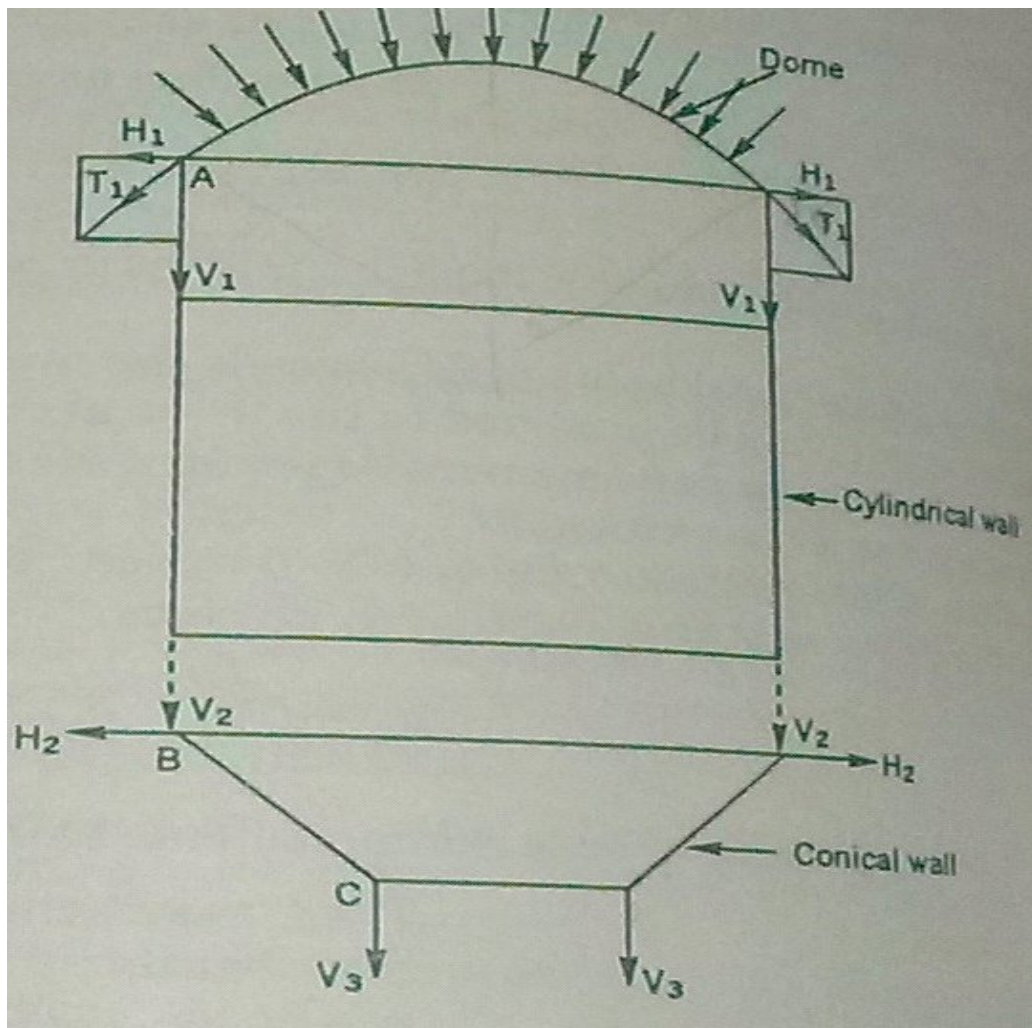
PLAN OF WATER TANK WITH FORCES ACTING
